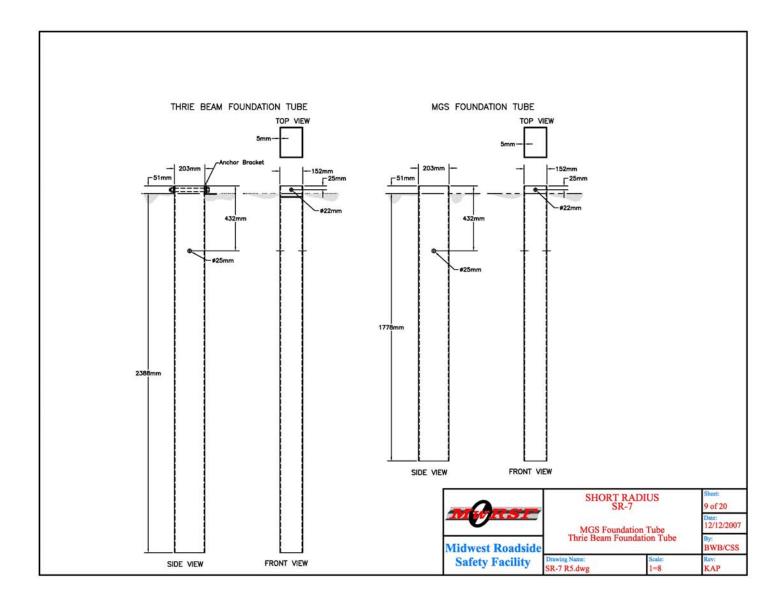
MGS Foundation Tube and Thrie Beam Foundation Tube Details
